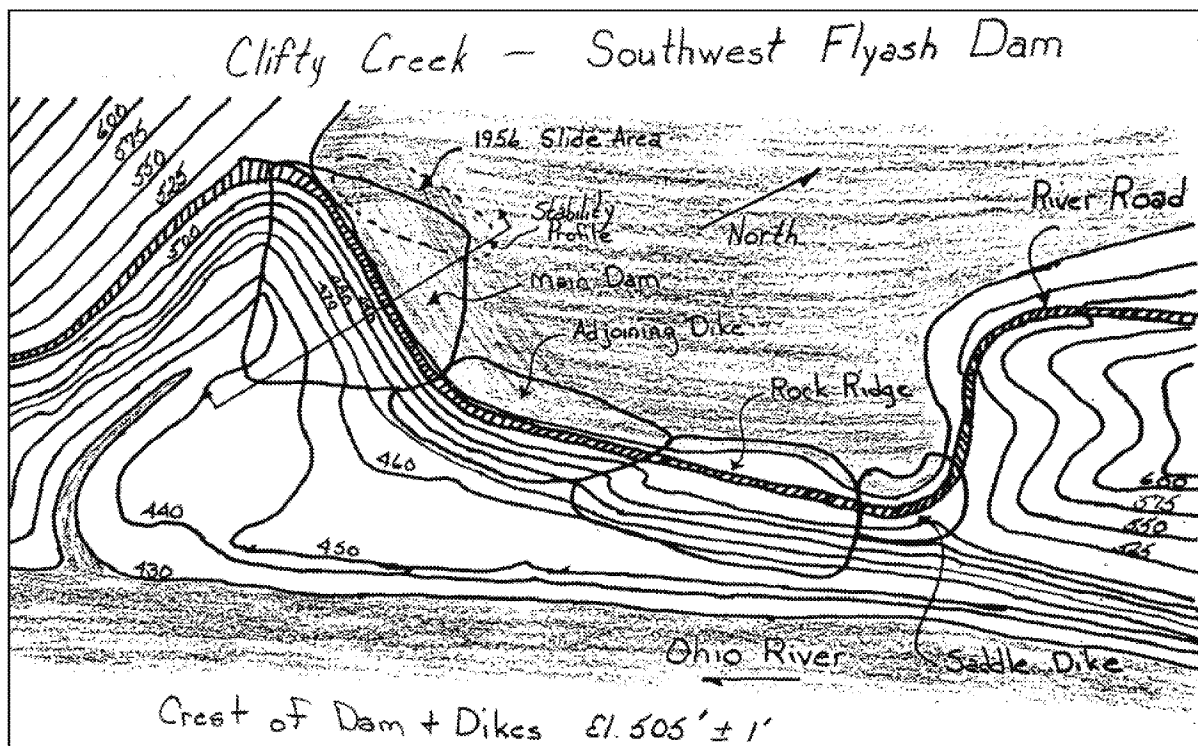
LRCP Dam Construction Detail (AEPSC, 1985)
